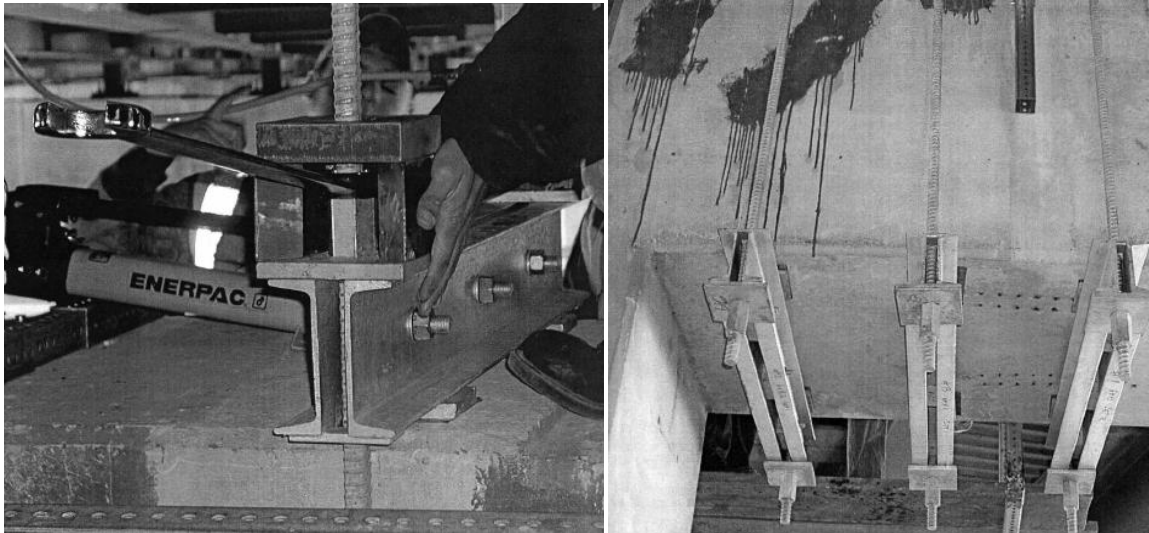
Post-tensioning system installation (GDOT, 2005): Top view of pier cap (left), Bottom view (right)
